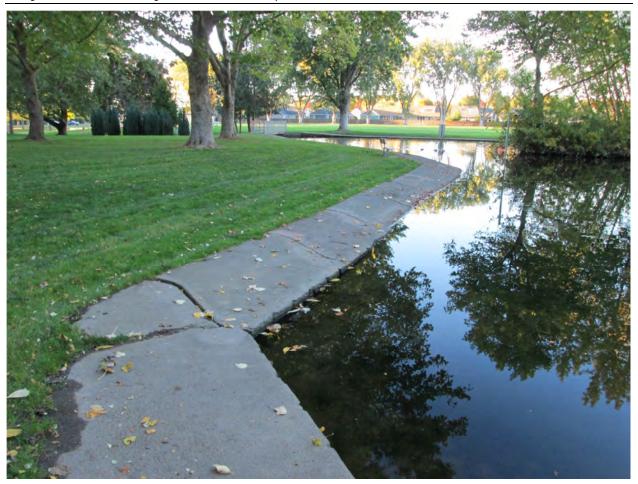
Sloping concrete pathway at the water's edge of the pond
